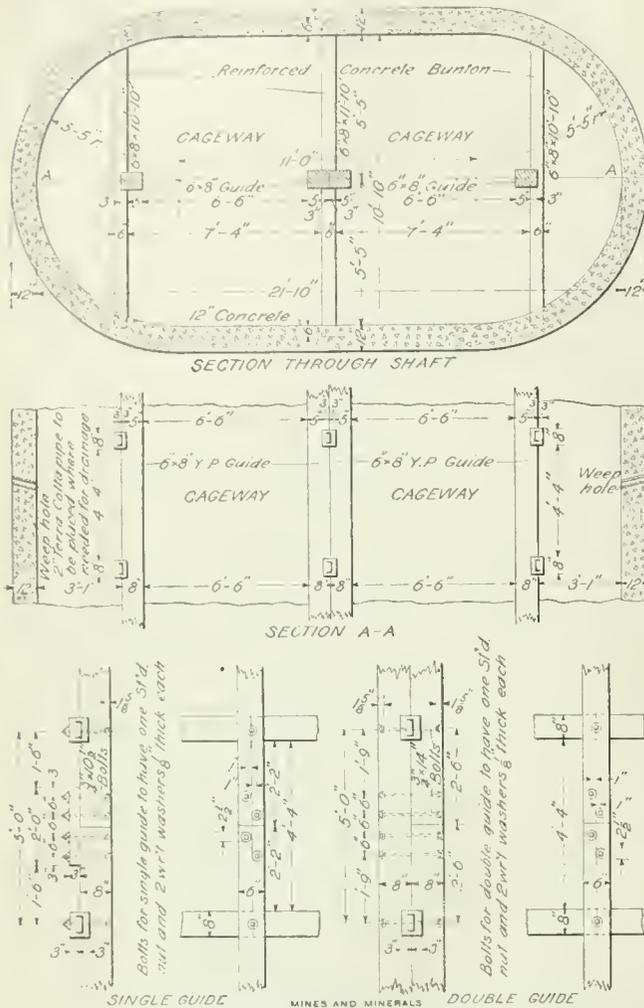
SECTION, ELEVATION AND DETAILS OF SHAFT LINING
